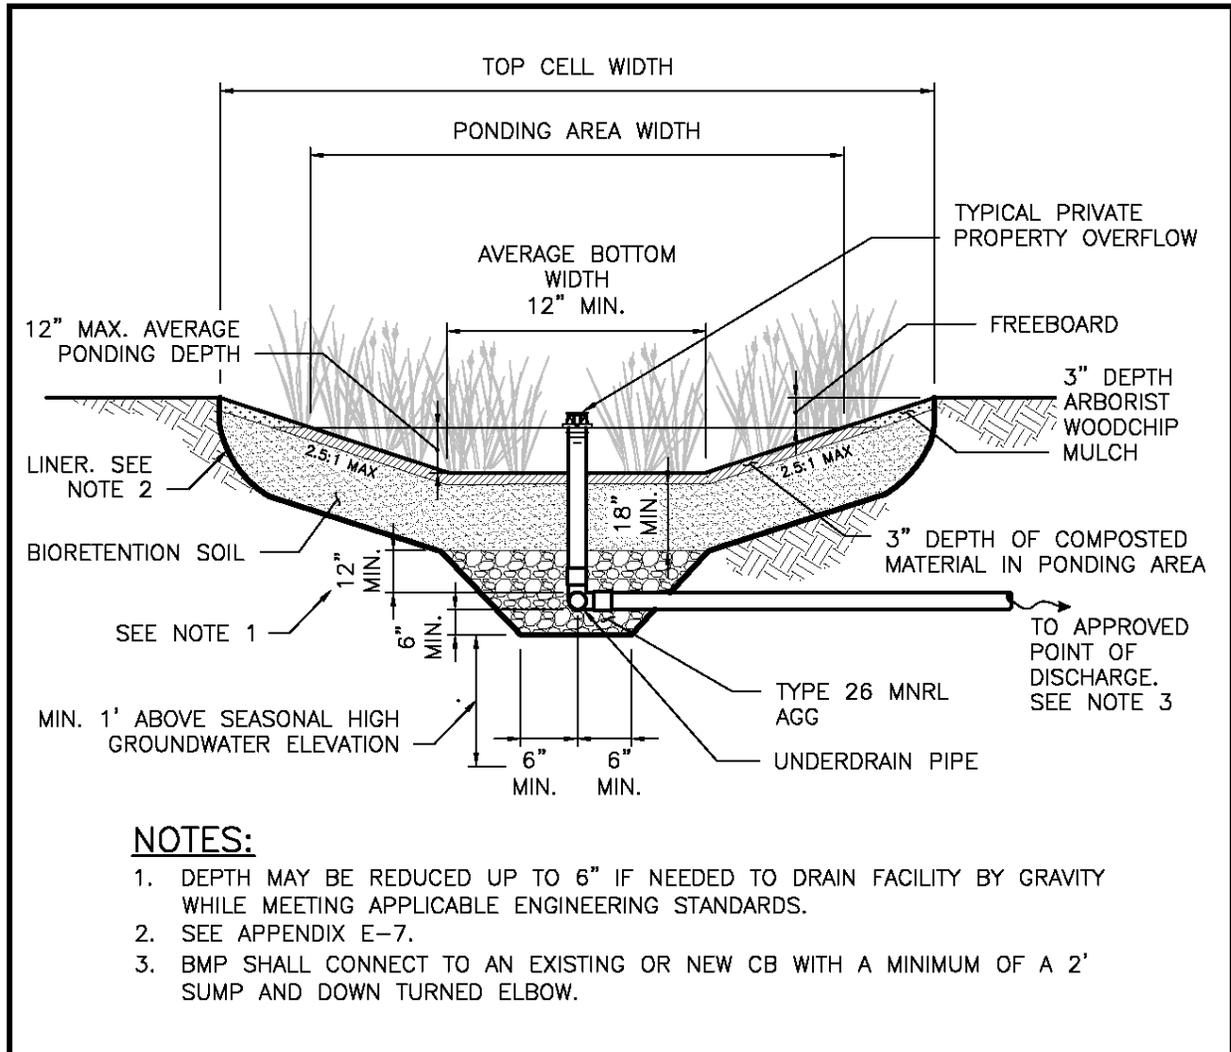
Non-infiltrating Bioretention Facility with Sloped Sides.
